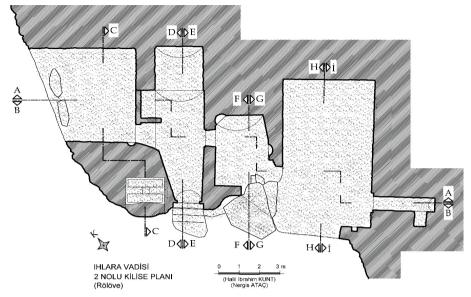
Church No. 2, plan (Drawing: Author, 2022)
